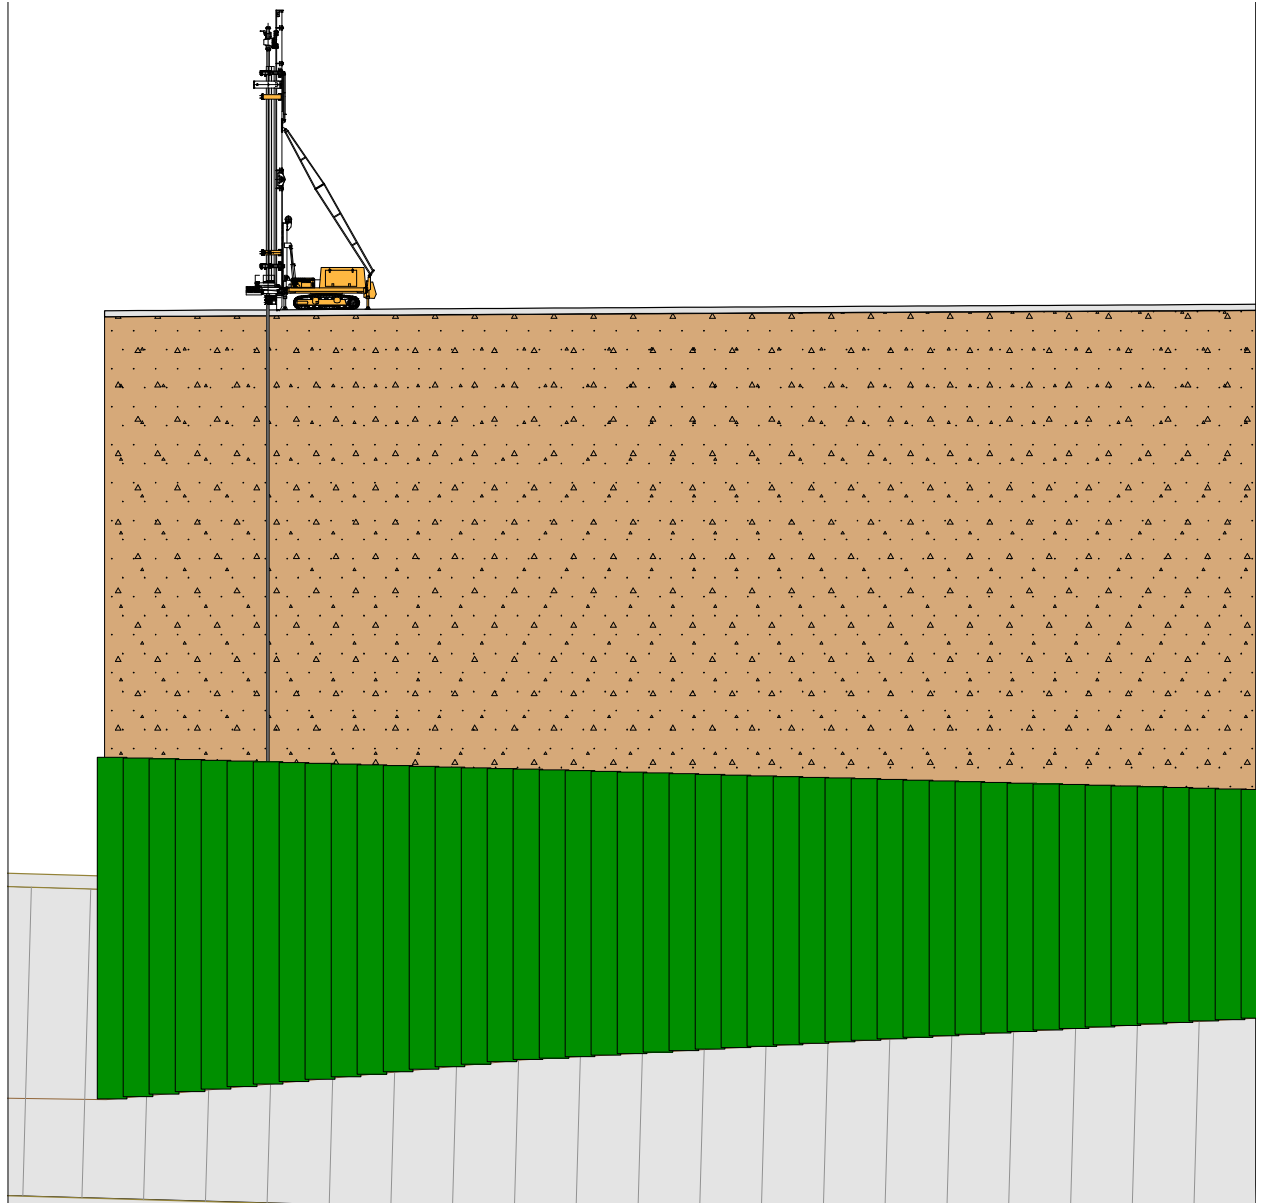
General longitudinal section showing columns' layout and depth at "Jaula" location
